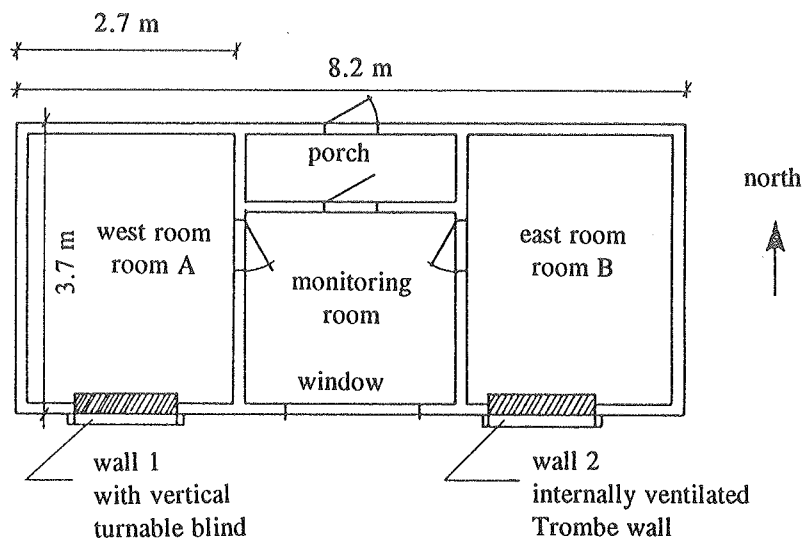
Layout of the experimental house where the two solar walls were tested.
